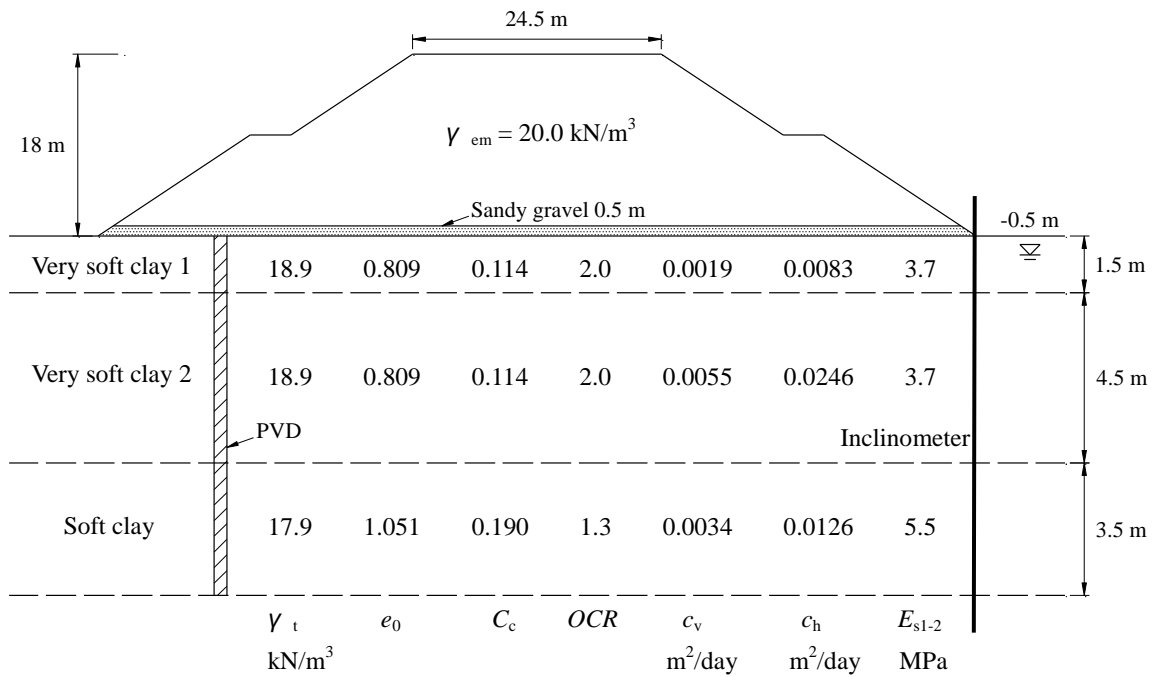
Cross-section and soil profile of embankment at K85 + 330
